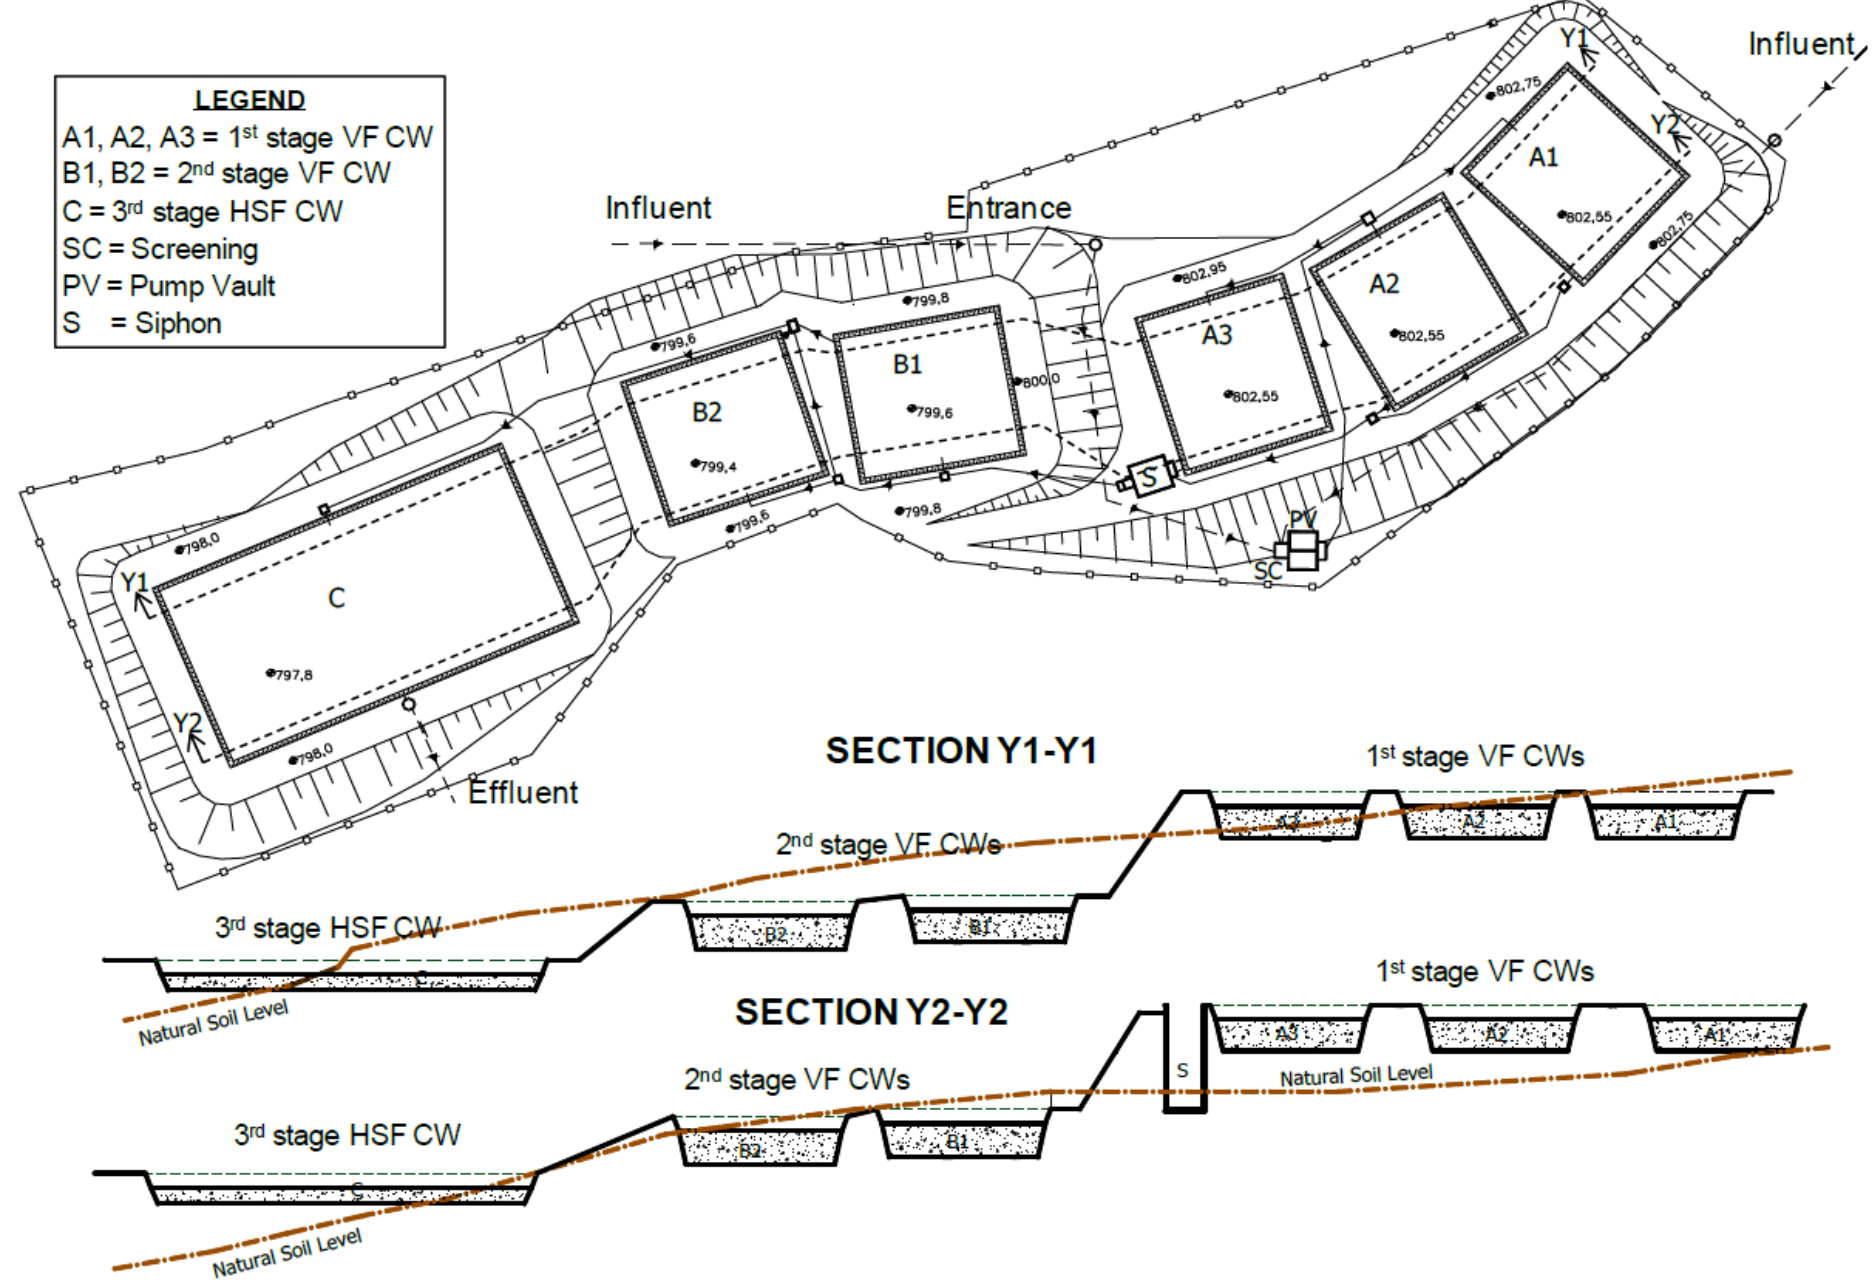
Facility plan view and sections Y1-Y1 and Y2-Y2 of Korestia facility.
